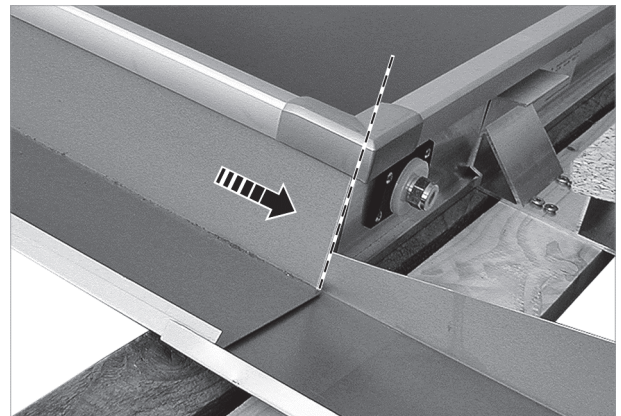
Sliding the lower side flashing until it reaches the lower edge of the collector frame
